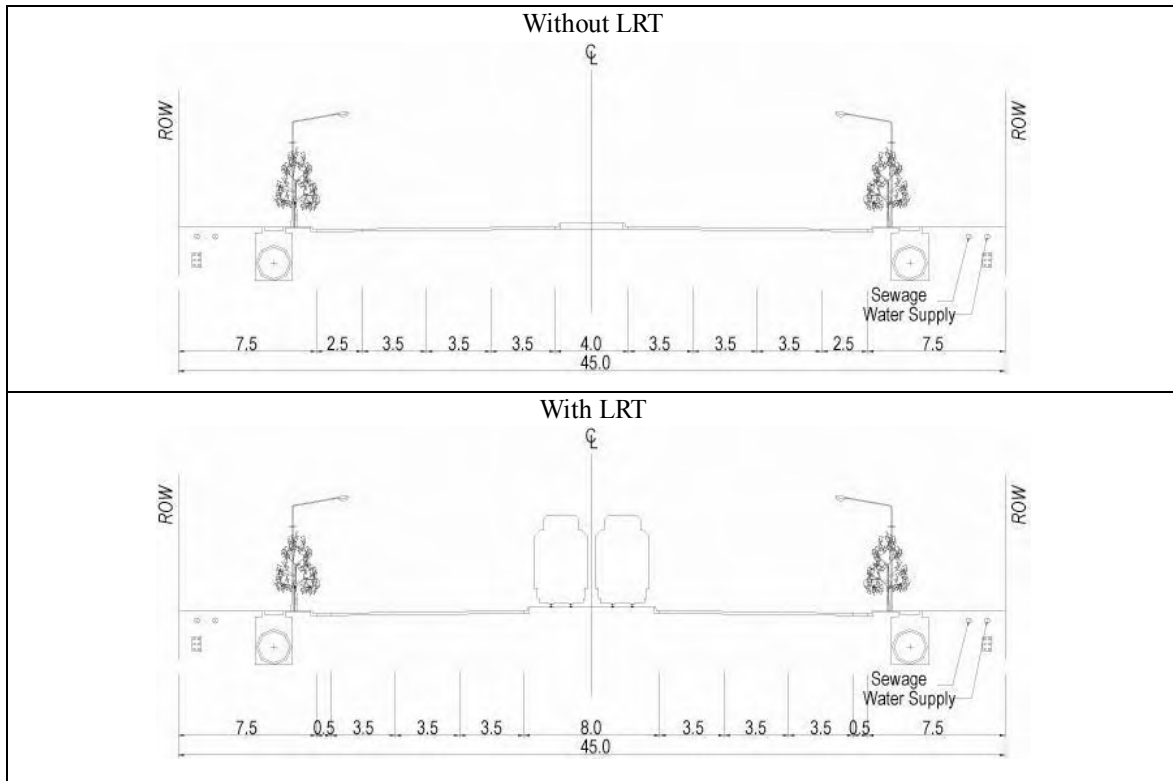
Typical Cross-section of a Primary Road (Type B: ROW = 45m)
